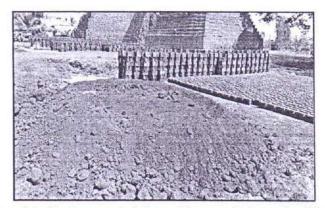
Bagasse Ash is used in manufacture of soil bricks.
